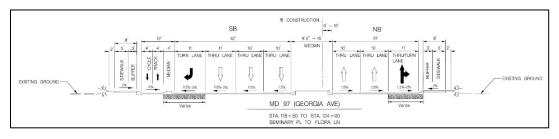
Proposed Typical Cross Section – Seminary Place to Flora Lane
